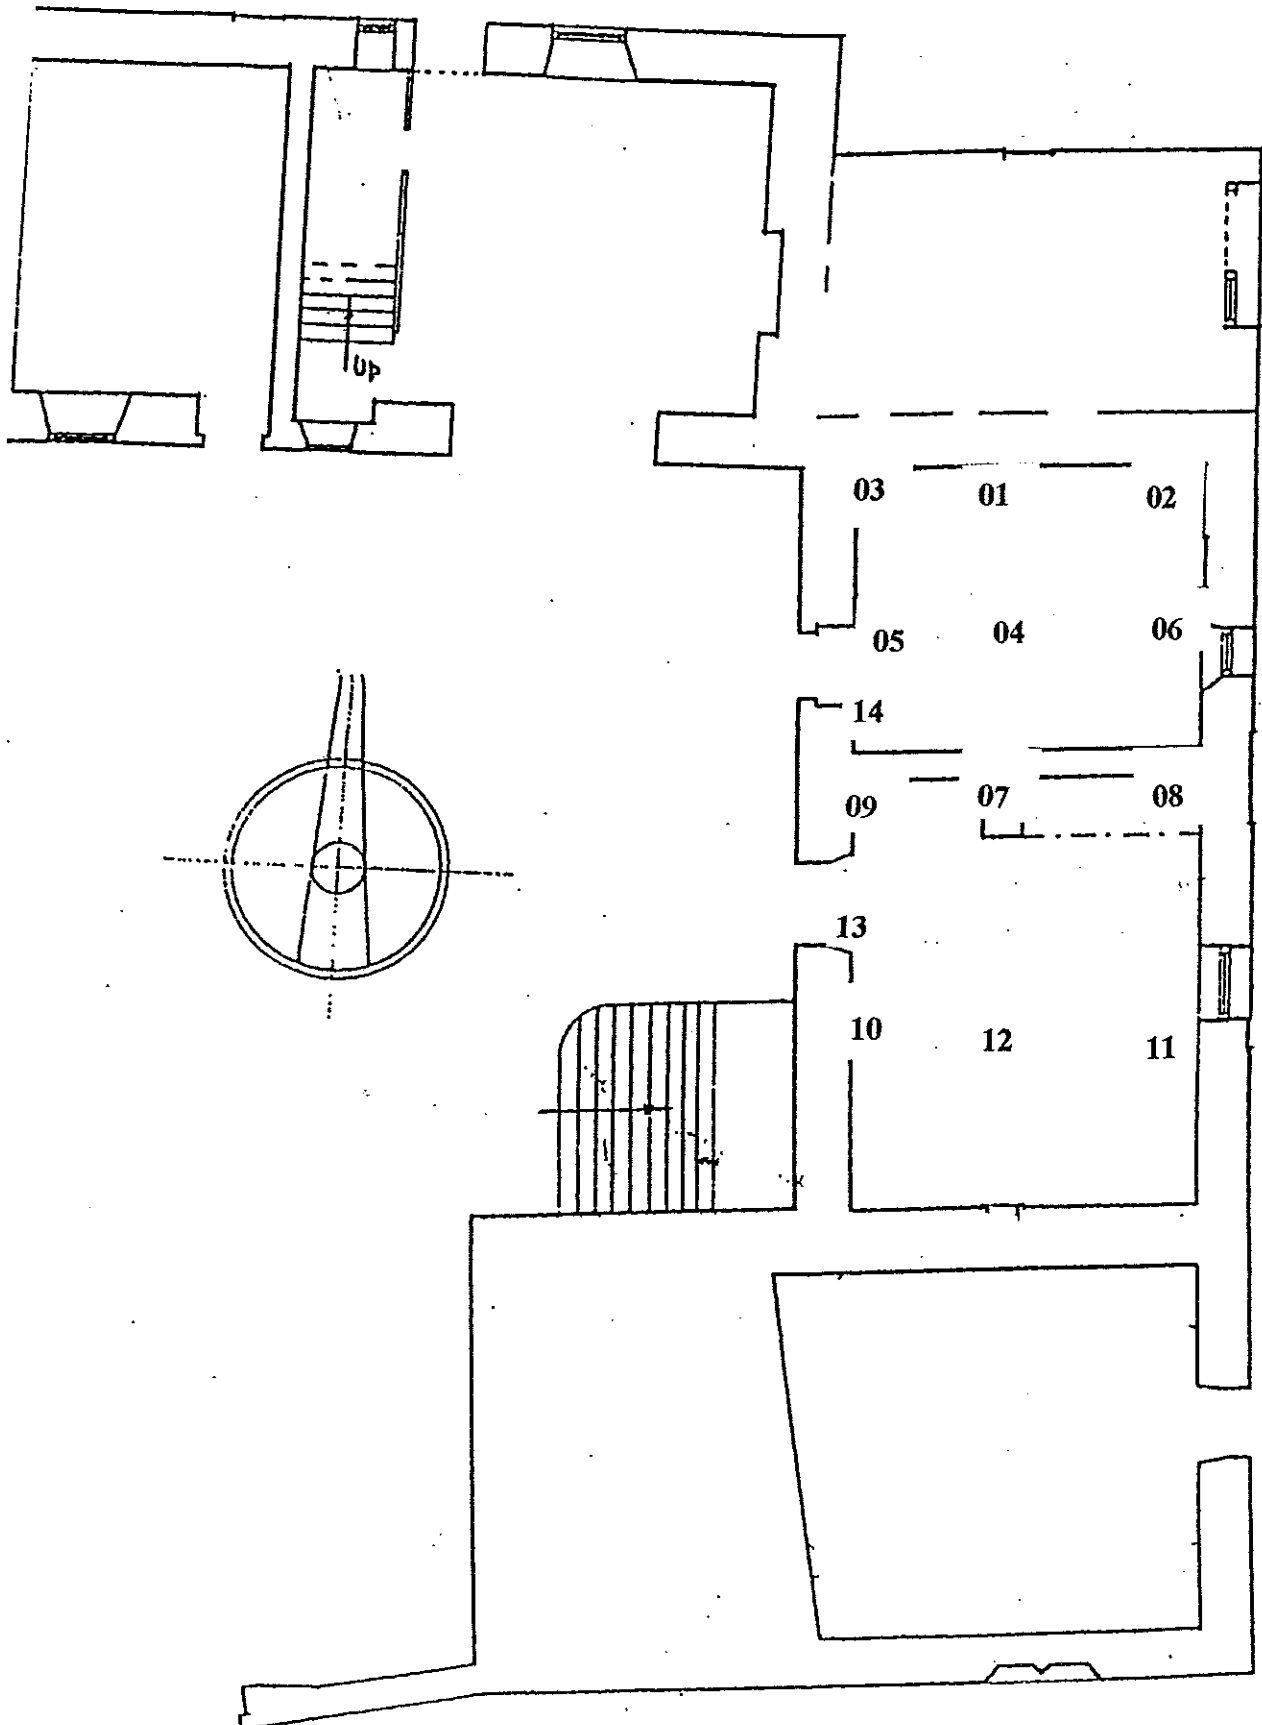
Plan to show approximate location of sampled timbers from the first-floor of the East range
